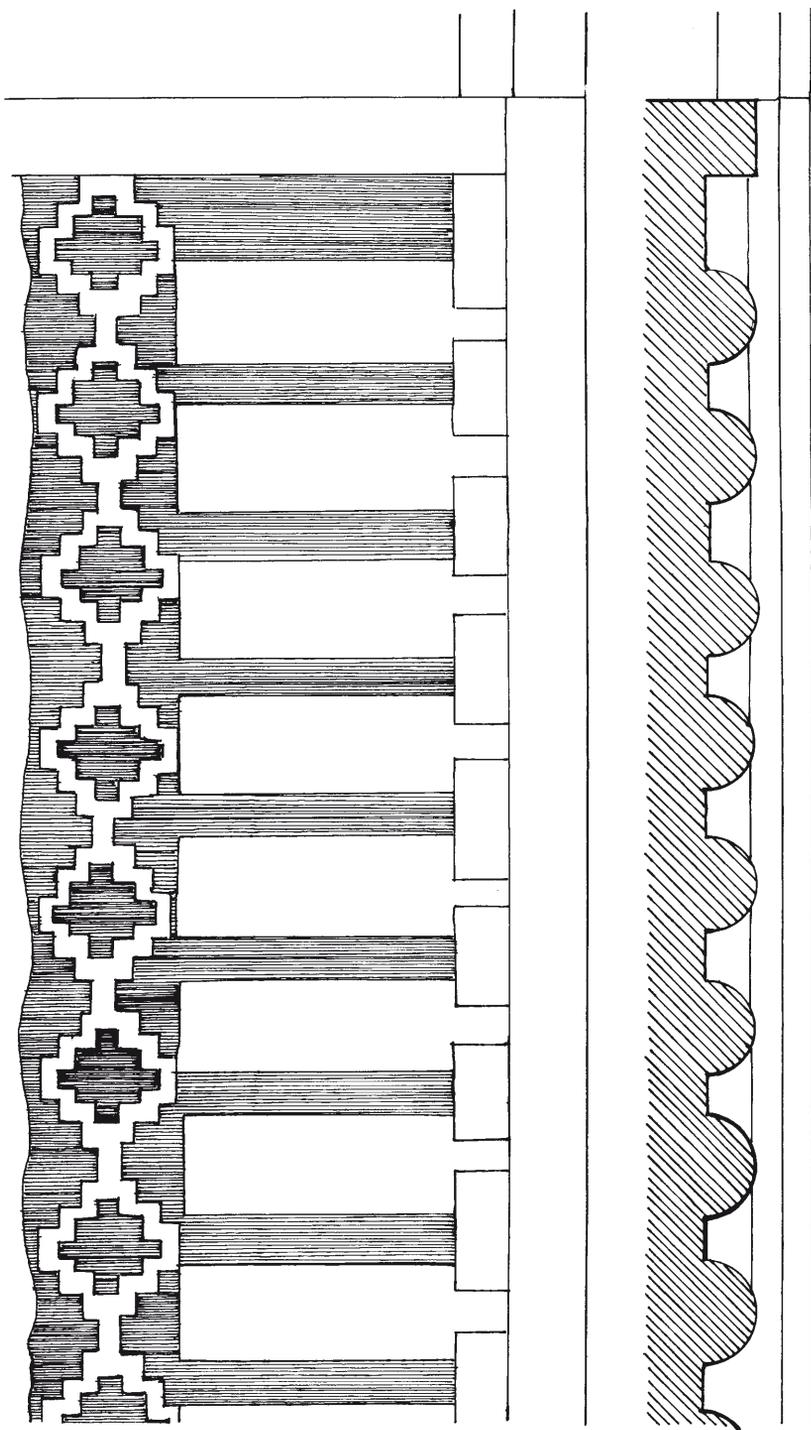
Mundigak, Afghanistan, plan and elevation of the wall of the palace.
